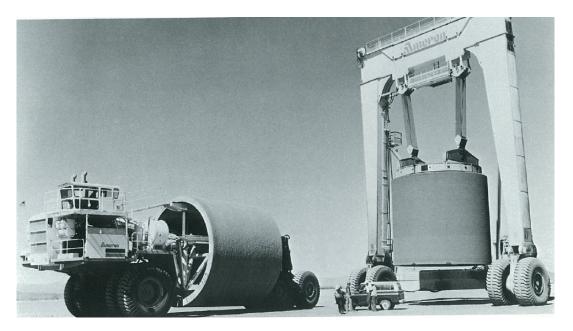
Ameron Used the "Pipemobile" and "Liftmobile" to Fabricate and Install 21-Foot-Diameter Pre-Stressed Concrete Cylinder Pipe On Site
